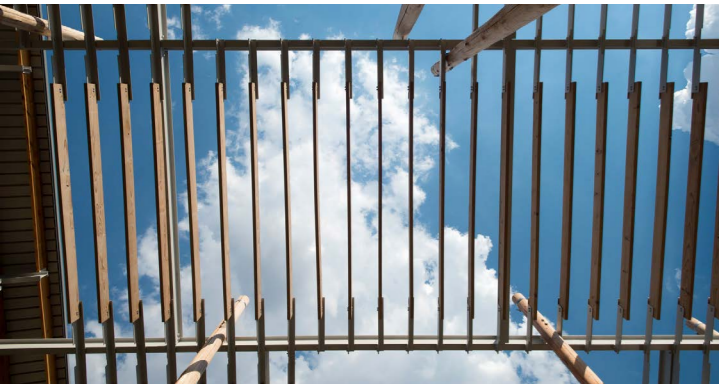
I-CAT Offices and Warehouse - Pergola Detail (ArchDaily, 2016)
